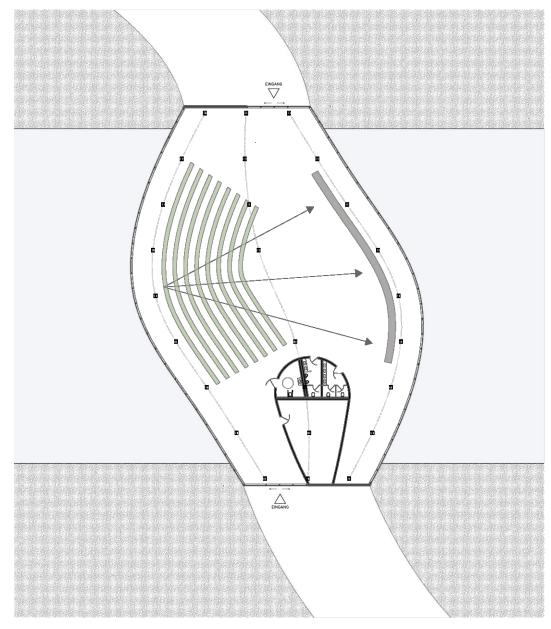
Floor plan - Building is used as a theater and for movie screenings
